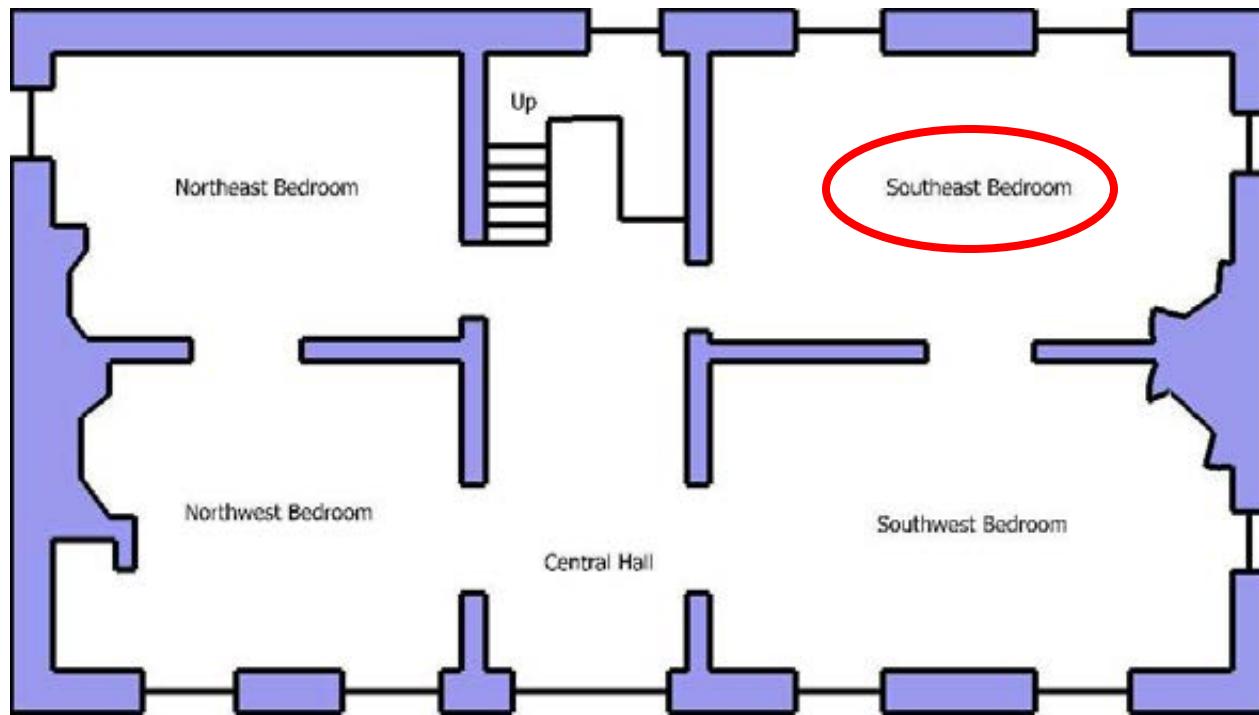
Plan of Bostwick's second floor showing the southeast bedroom. Drawing by Kathleen Manicke.
